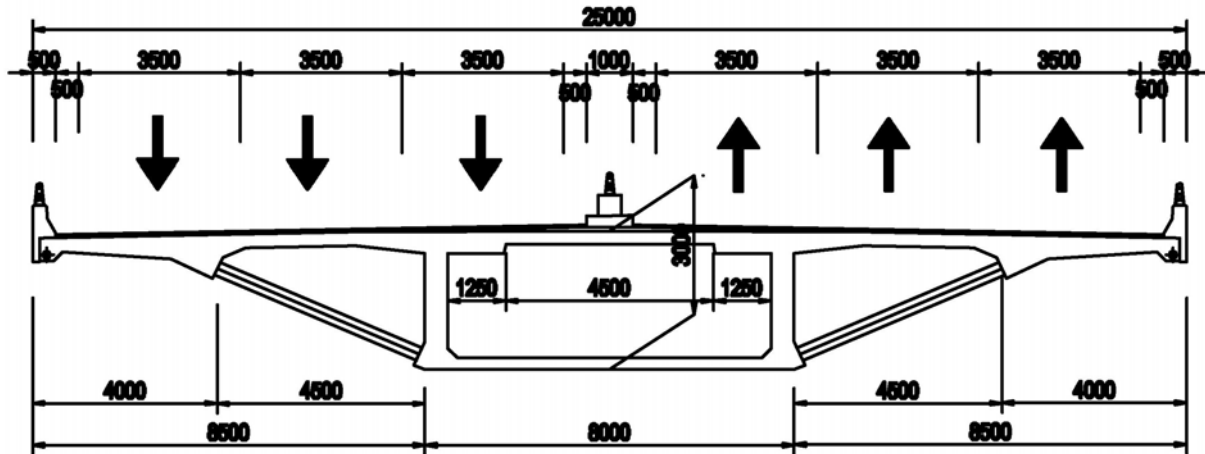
Typical Cross Sections of Alternative (3), Case 6-3.5
